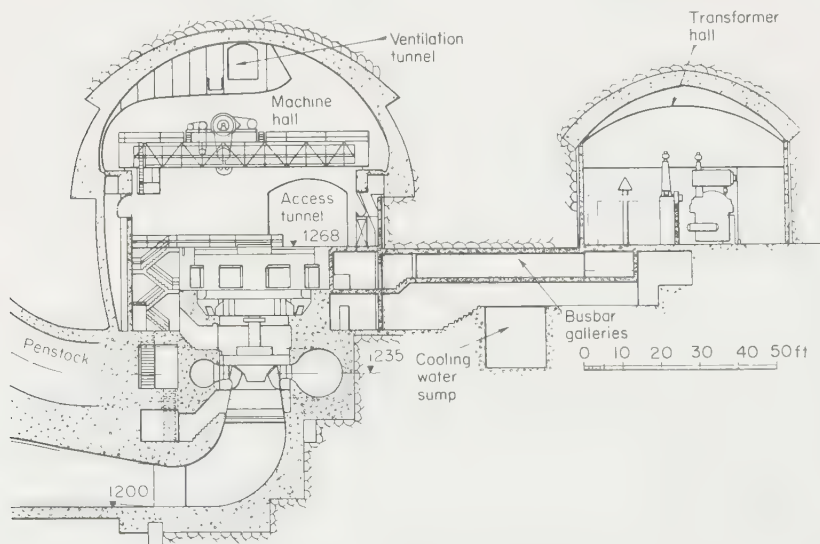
Kariba Gorge powerhouse, vertical section showing arrangement of powerhouse and transformer hall.
